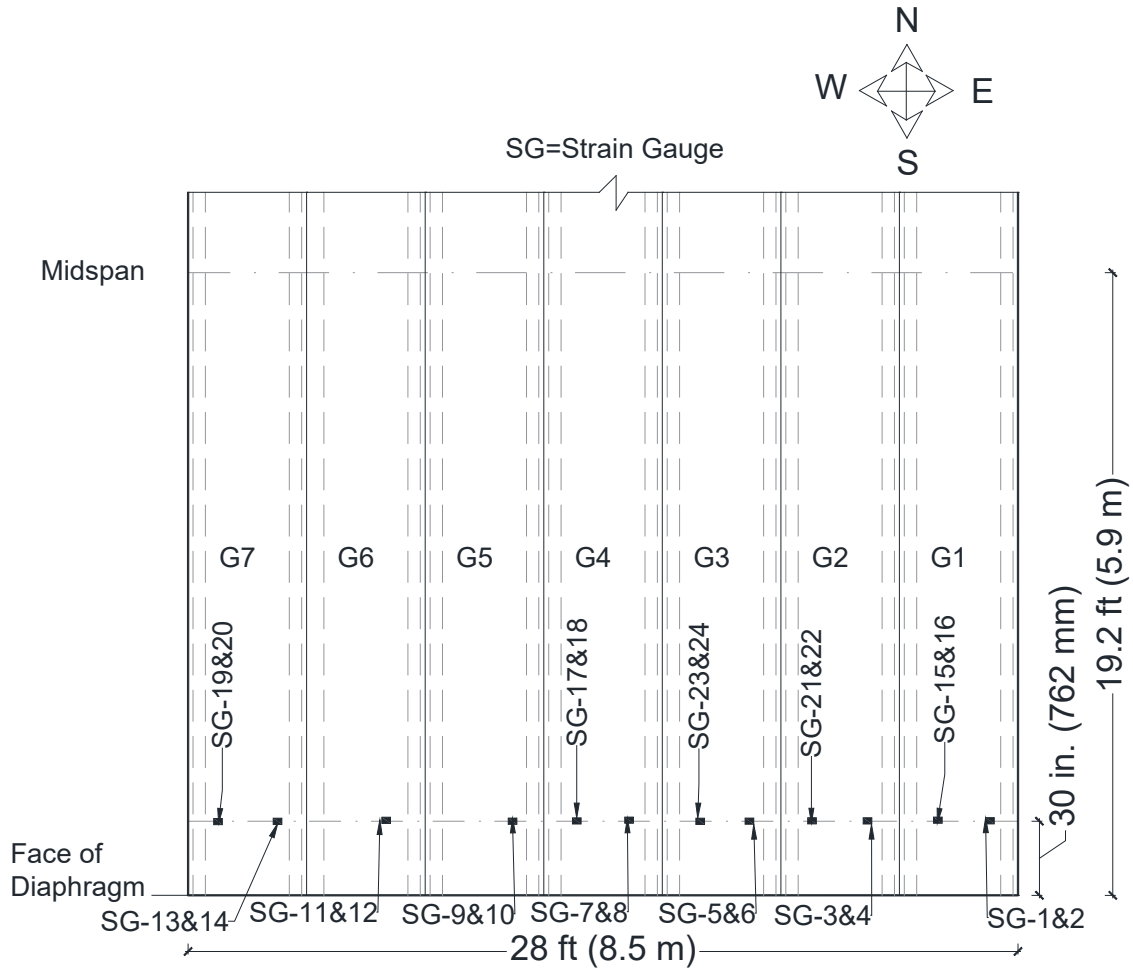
Strain Gauge Instrumentation Plan for Shear Response of 30-in. Deep Double-Tee Girder Bridge – Plan View
